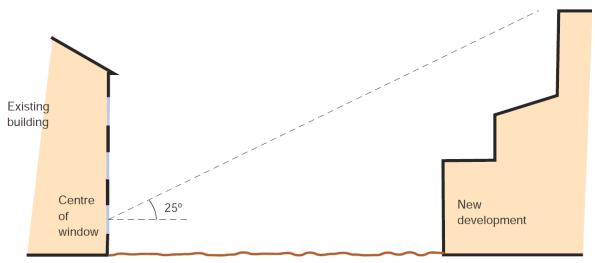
Section perpendicular to a main window wall of an existing building showing a new development
